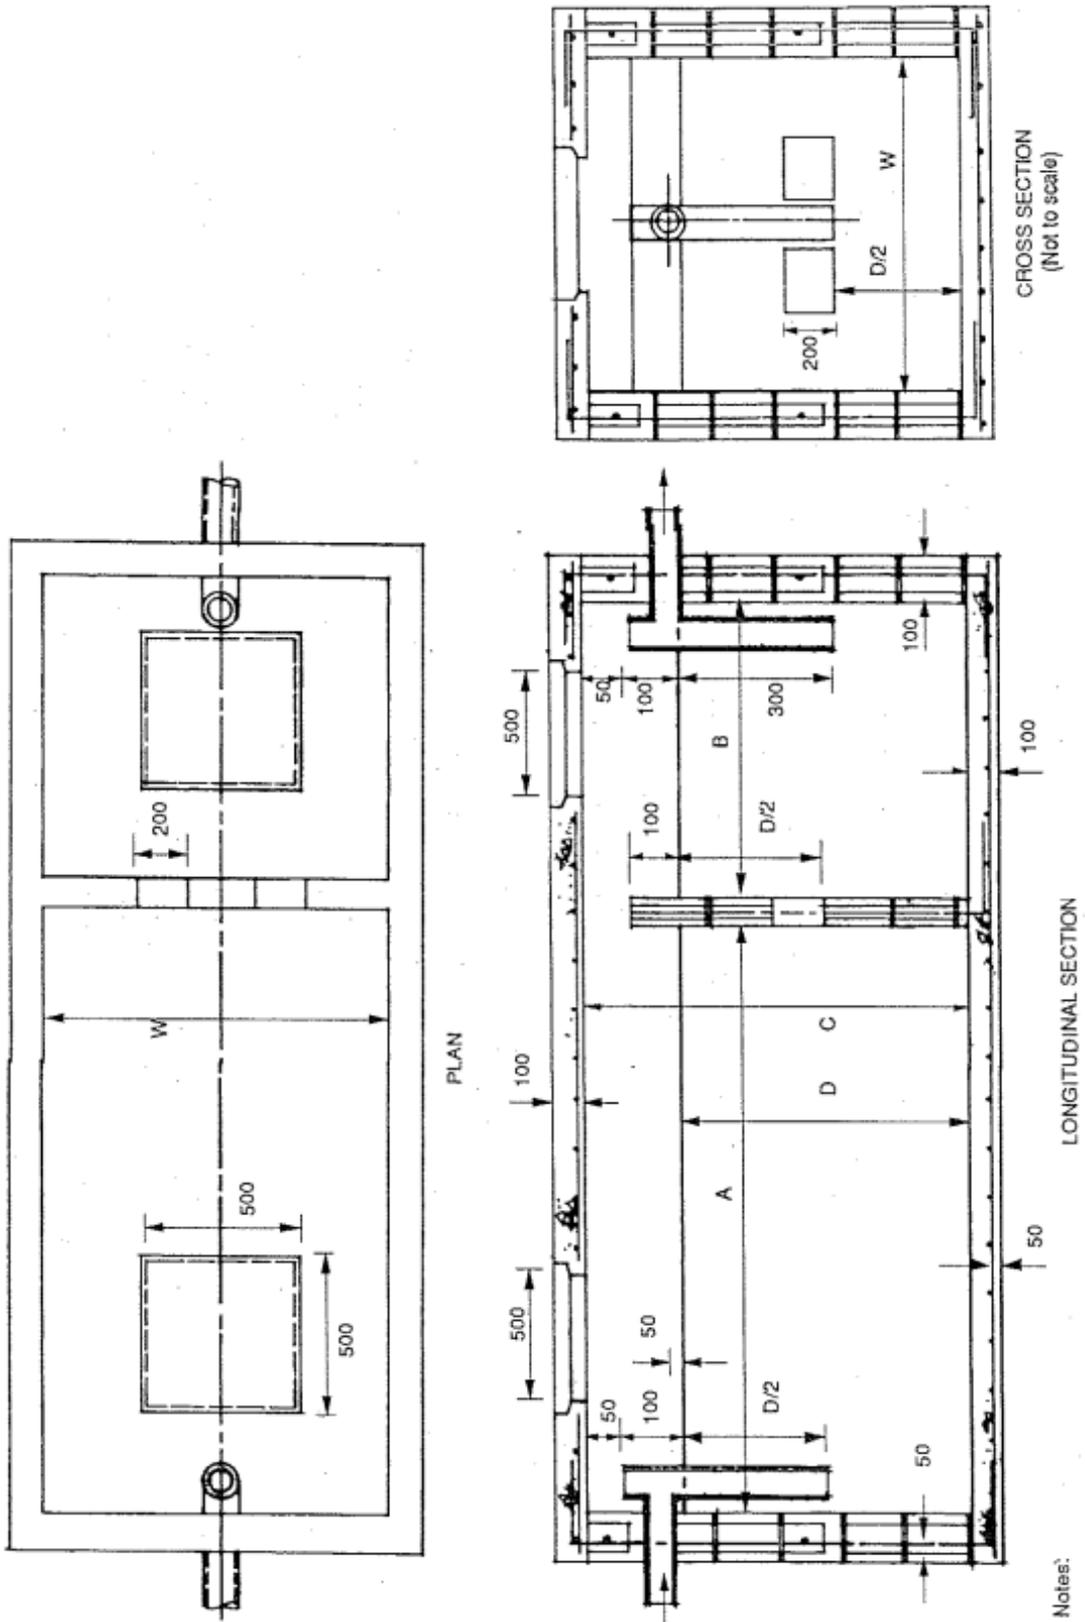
Details of Reinforced Block Masonry Septic Tank
